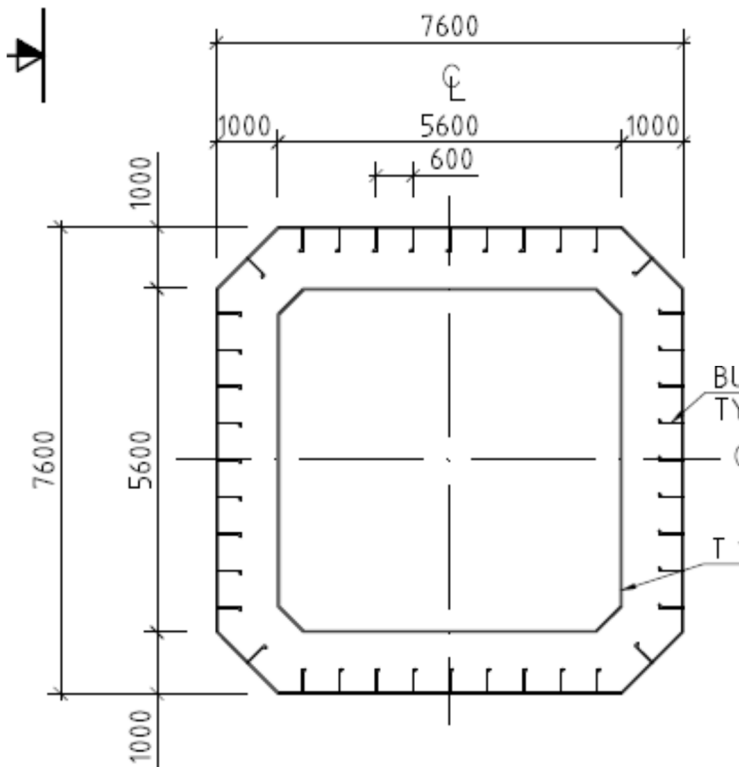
Columns cross-section, Axis 3-8. SBJ-33-C5-AMC-22-DR-471 /1/.
